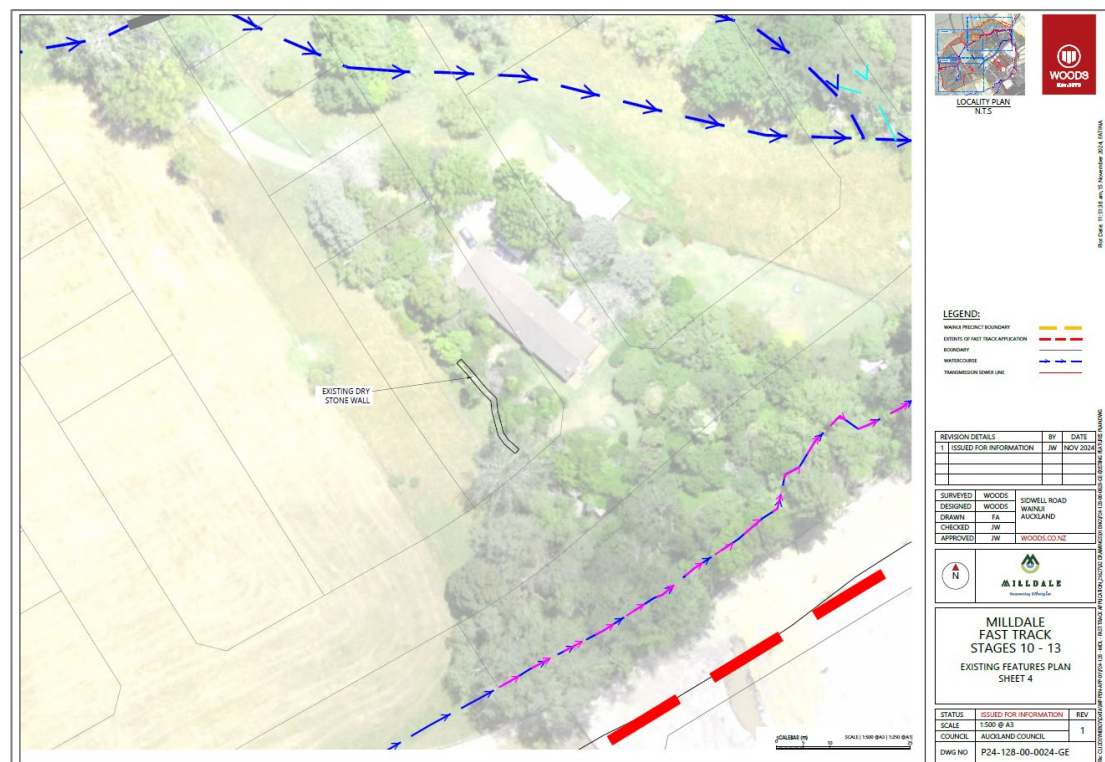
Existing Features Plan – Stone Wall Location in Stage 10: Source: Appendix 5B.
